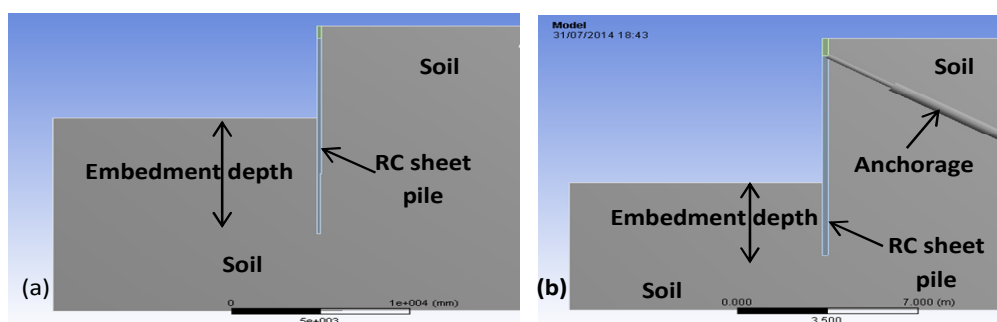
(a) Cantilevered sheet pile model (b) Anchored sheet pile model
